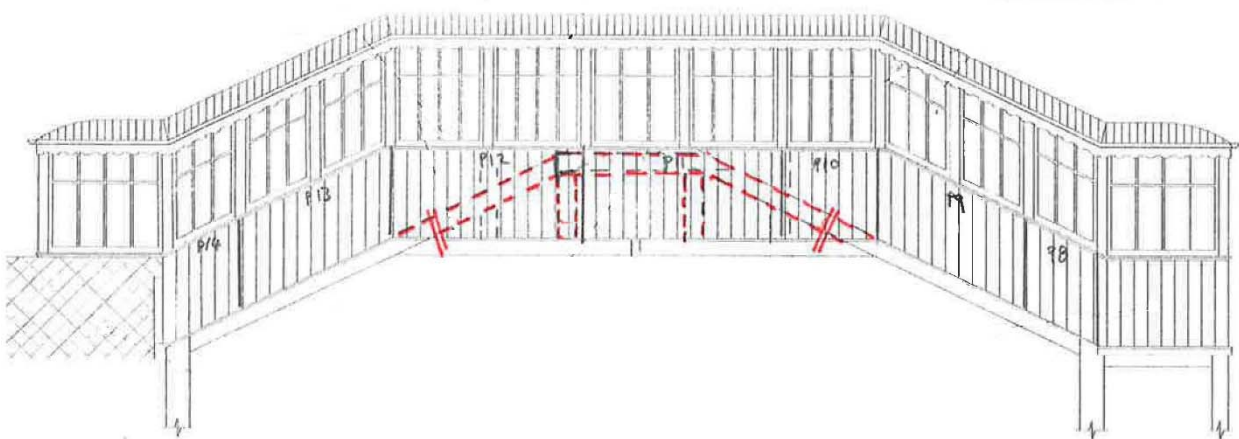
Believed structural form of Alton Footbridge from photos and video evidence
